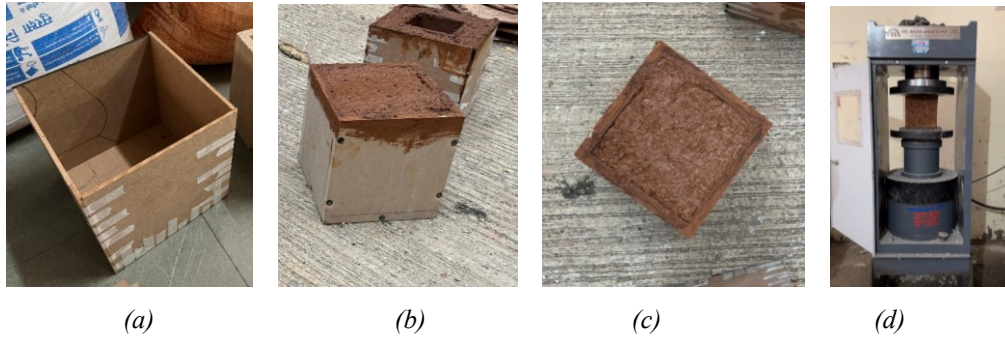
(a) mould design; (b) solid block casted in mould; (c) block kept for sun drying; (d) compressive strength testing of solid block
